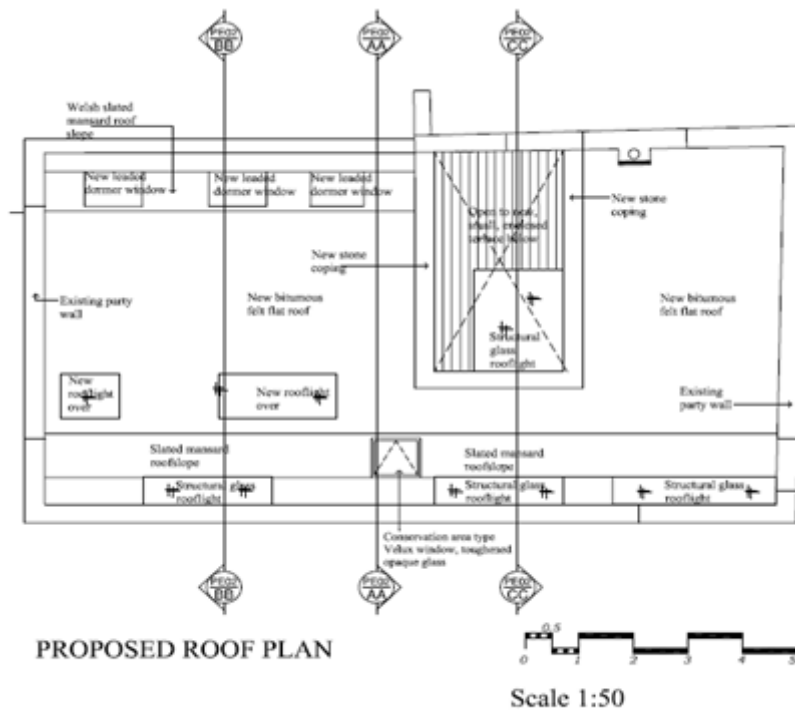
Proposed Roof Plan showing enclosed terrace area
